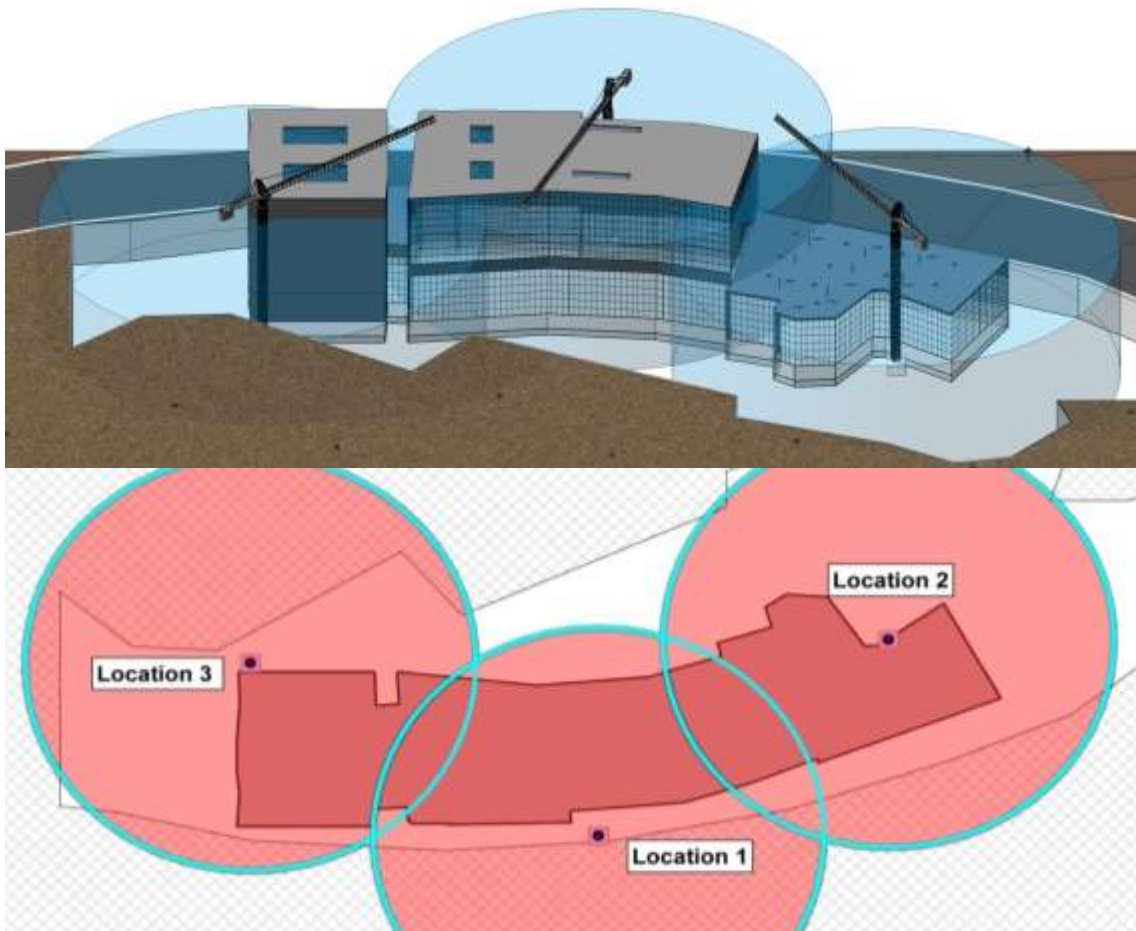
3D BIM (top) and GIS plan (bottom) views for optimal locations of tower cranes
